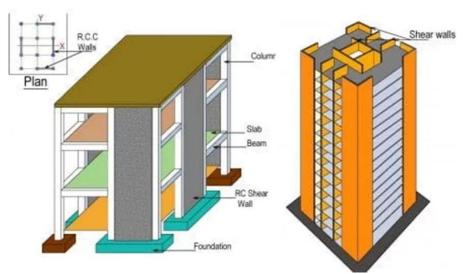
An example of a Shear Walls Structures System (https://dailycivil.com)
